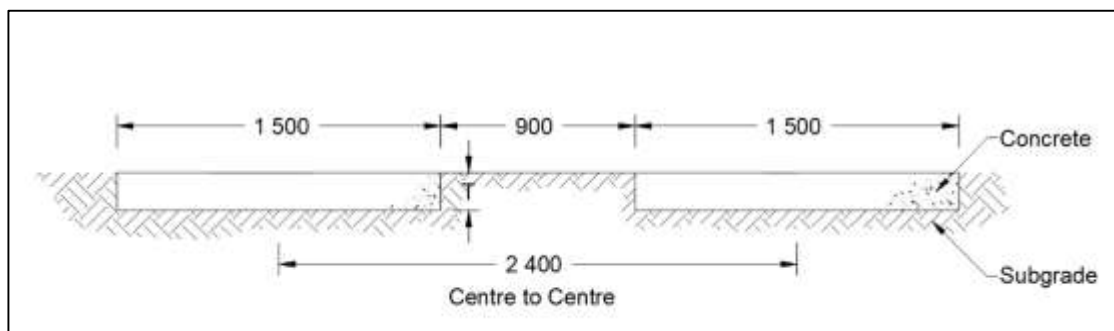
Typical cross-section of concrete strip road where three-wheeled vehicles are expected
